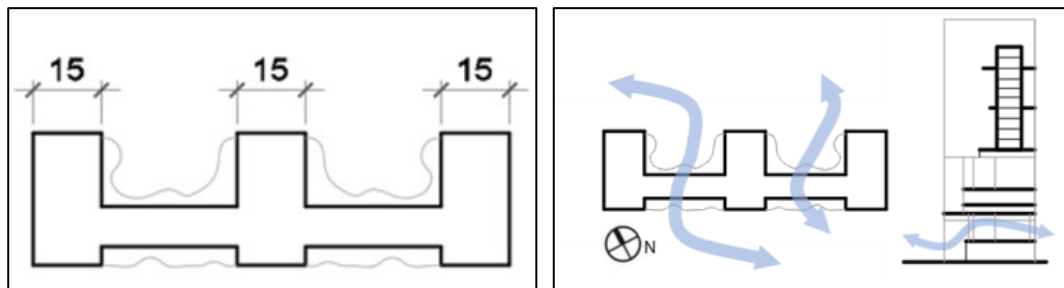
a) Plan depth b) Plan and section of the building showing the airflow path (Sharma, Bisen, Hongbo, & Yanming, 2018)
